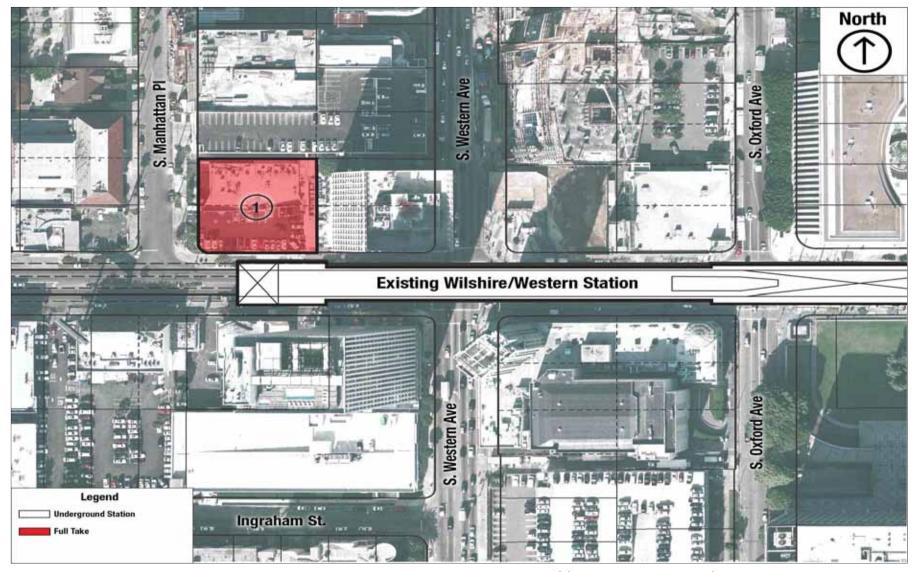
Wilshire/Western Station North Construction Staging Area Option
